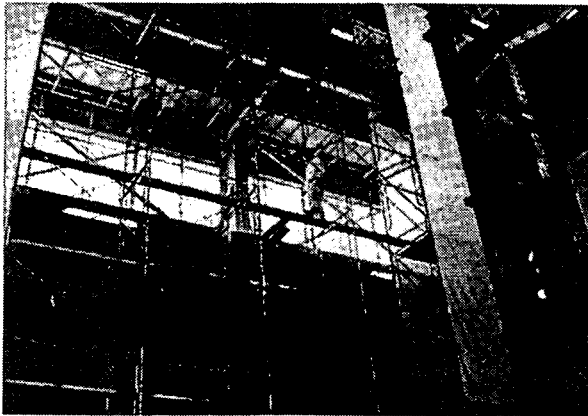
View of the experiment: The test being carried out is with a 240 mm-wide footing board.
